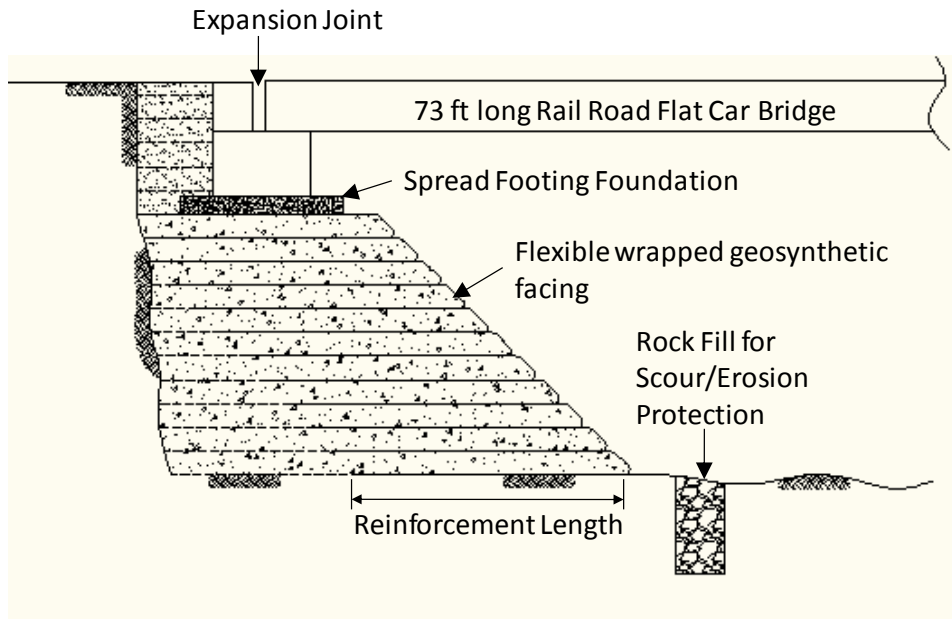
Schematic of GRS bridge abutment with geosynthetic wrapped sheets flexible facing at a bridge site in Buchanan County (Olympic Ave.) (Vennapusa et al. 2012)
